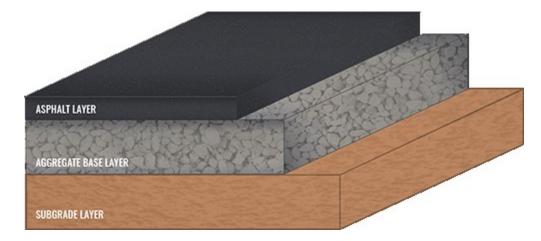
Road structure in pavement engineering (Bituminous Roadways, 2023)
